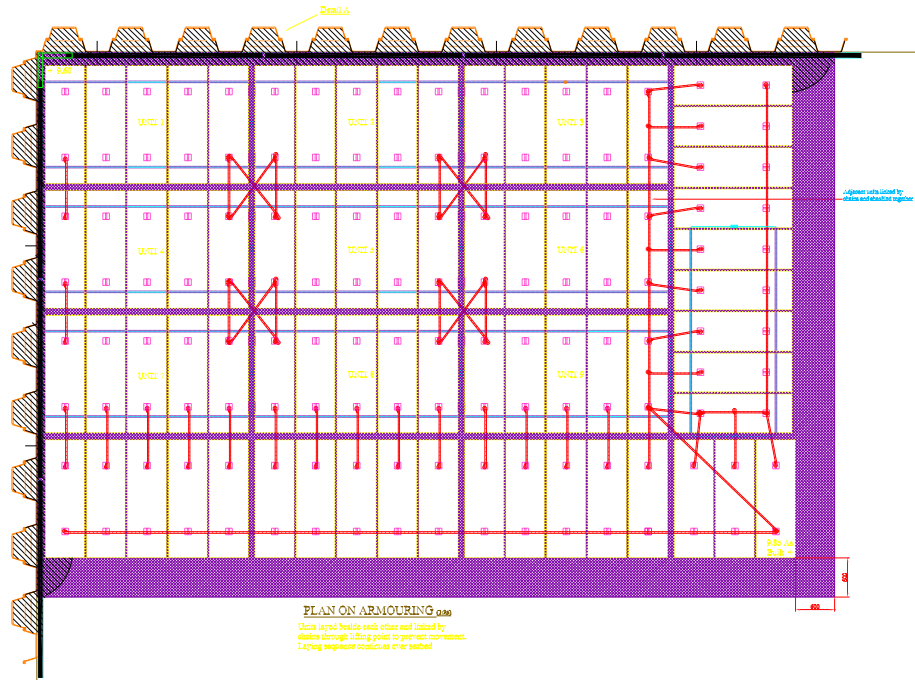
Arrangement of concrete blocks phase 3 (NB Phase 2 similar but with only 4 block sets in the corner of the berth)
